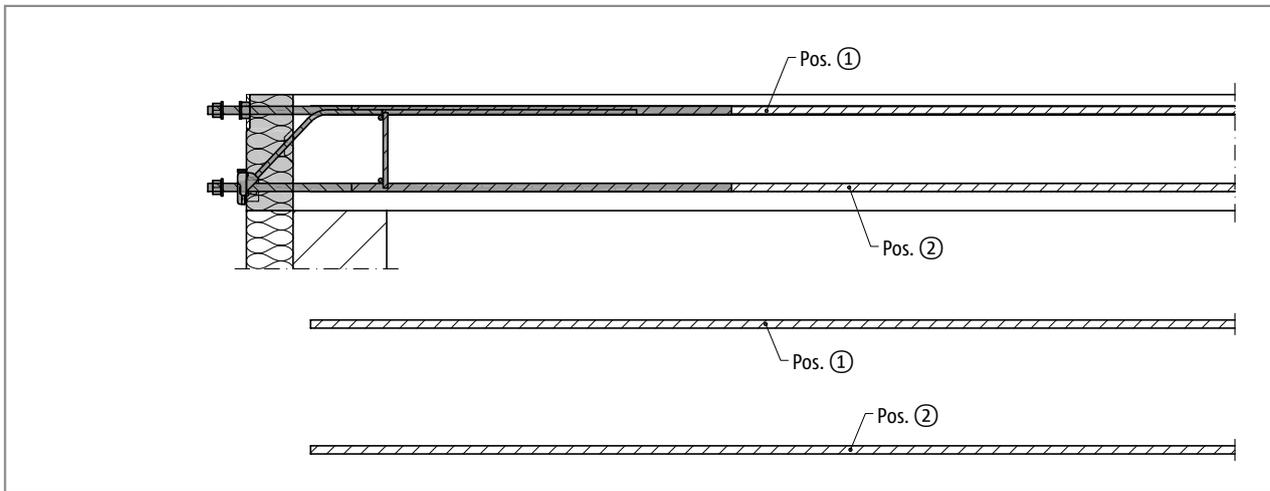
Schöck Isokorb® T type SK-MM1: On-site reinforcement: Cross section
